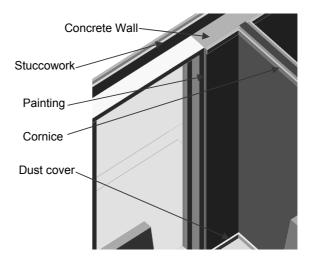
Detailed of a typical floor (Detail A Figure 1)
